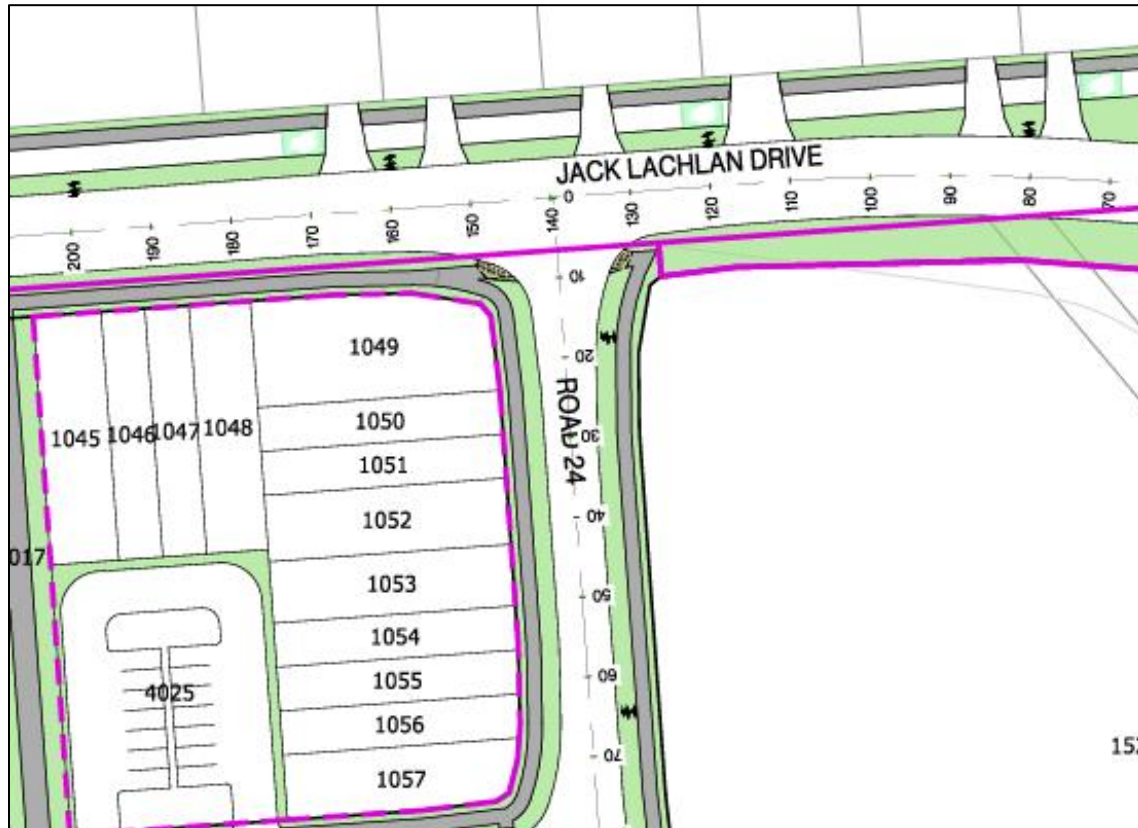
Road 24 Industrial Local / Jack Lachlan Drive Intersection
